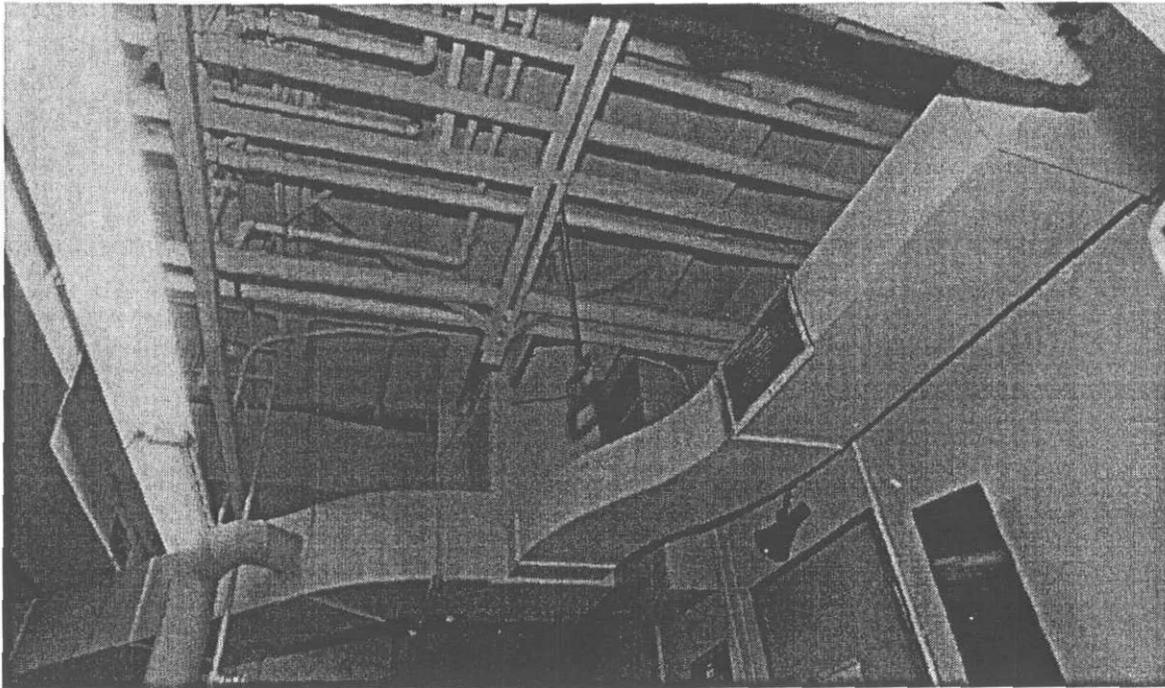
Typical lighting, piping and ducting in the former Helium Laboratory.
